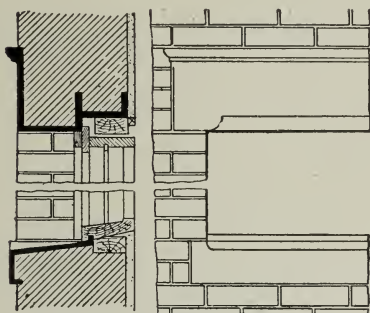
Detail Section. Cast-iron Window Lintel and Sill.
